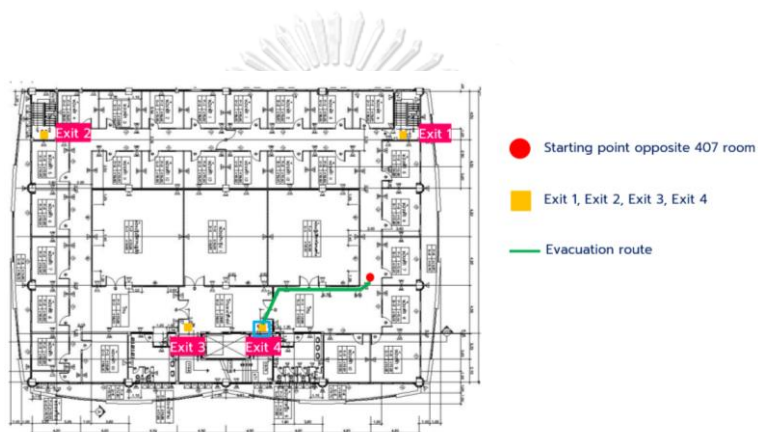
The evacuation plan and exits on the 4<sup>th</sup> floor of scenario 1(a).
